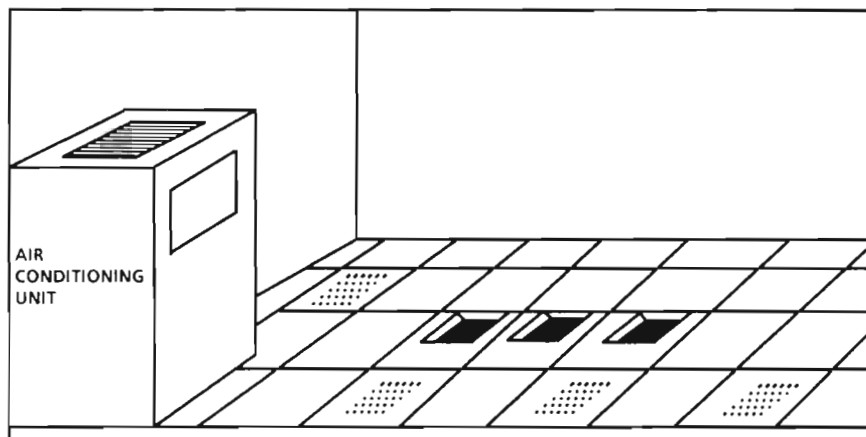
The holes in the floor panels must be made prior to the installation. Room and floor must be cleaned.
